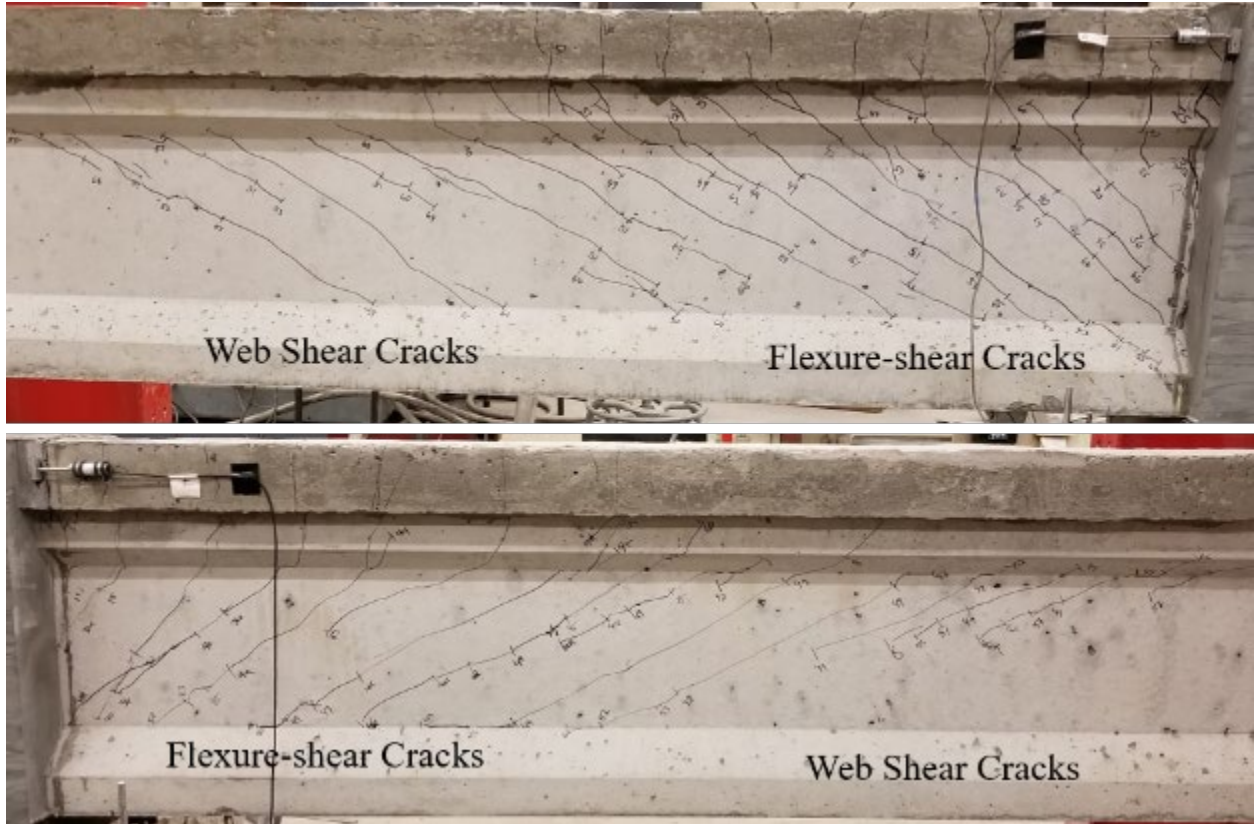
RC2-N girder with flexure-shear cracks and shear cracks (top) and RC2-S girder with flexure-shear cracks and shear cracks (bottom)
